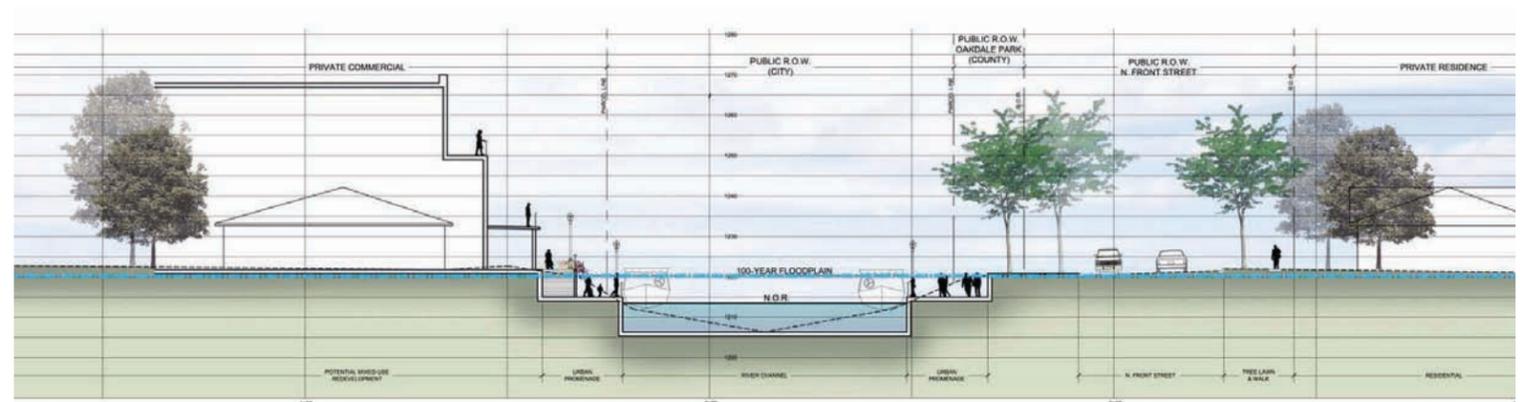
Concrete Channel with River Walk (typ.)
